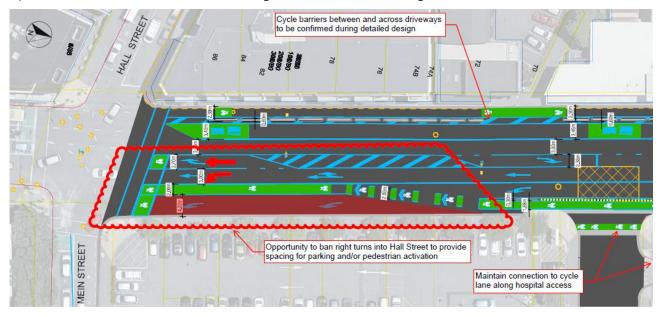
Riddiford Street / Mein Street / Hall Street – Proposed options
